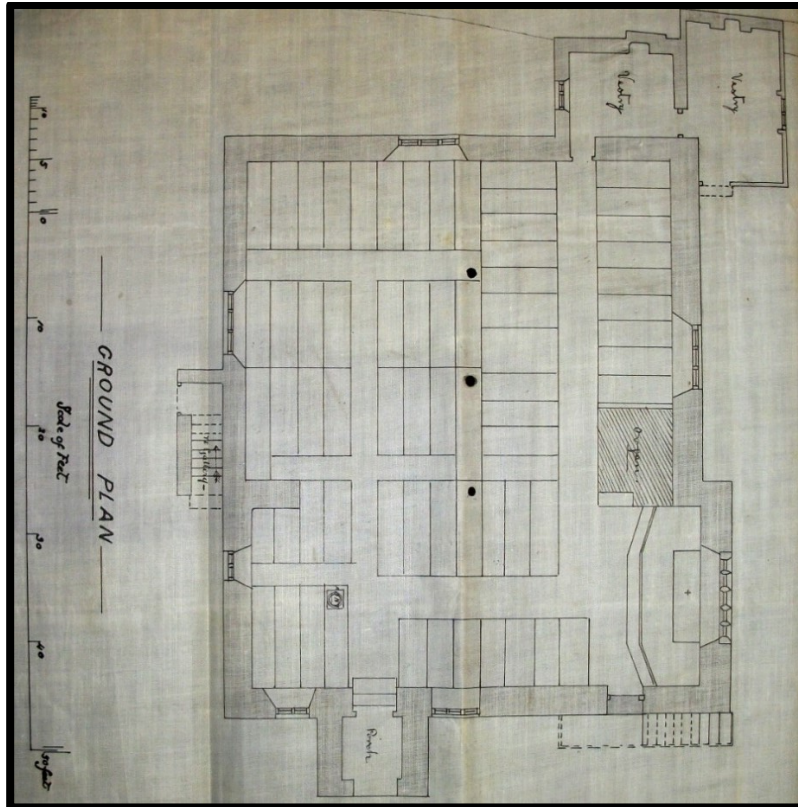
Ground plan made in 1880-81, showing the plan of the building after the addition of the aisles of 1790 and 1812 (SWHT: Shaldon, St Nicholas, Faculty Petition 2).
